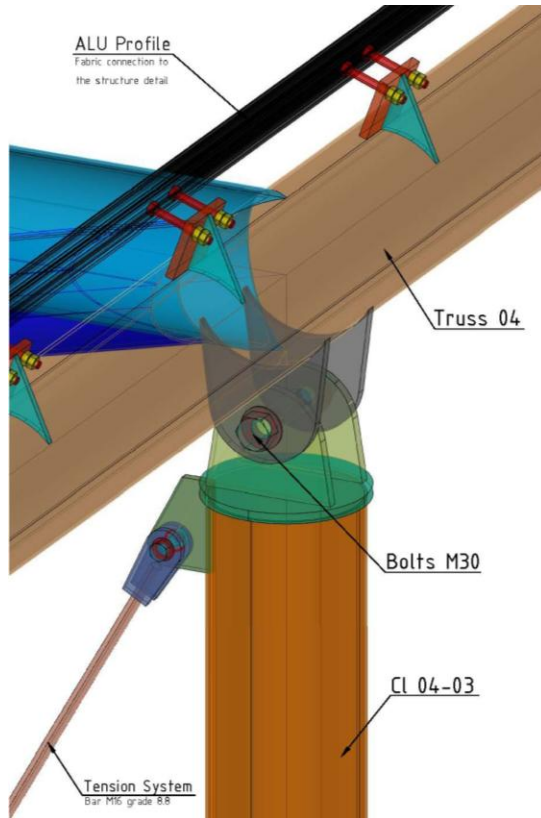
The above image shows the corner columns .hinge connection to the main trusses
